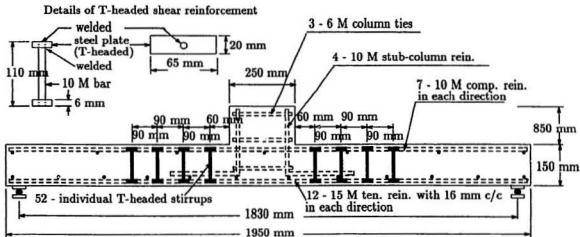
Dimension and reinforcement details of the slab with T-headed shear reinforcement (HS23)
